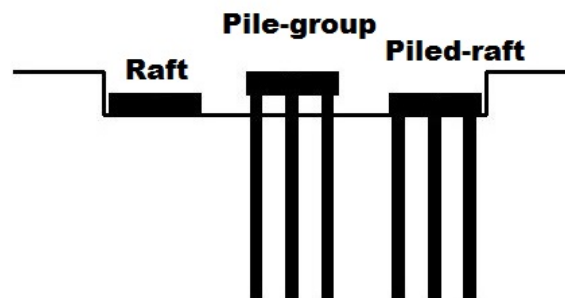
Types of foundations: raft, pile-group and piled-raft
